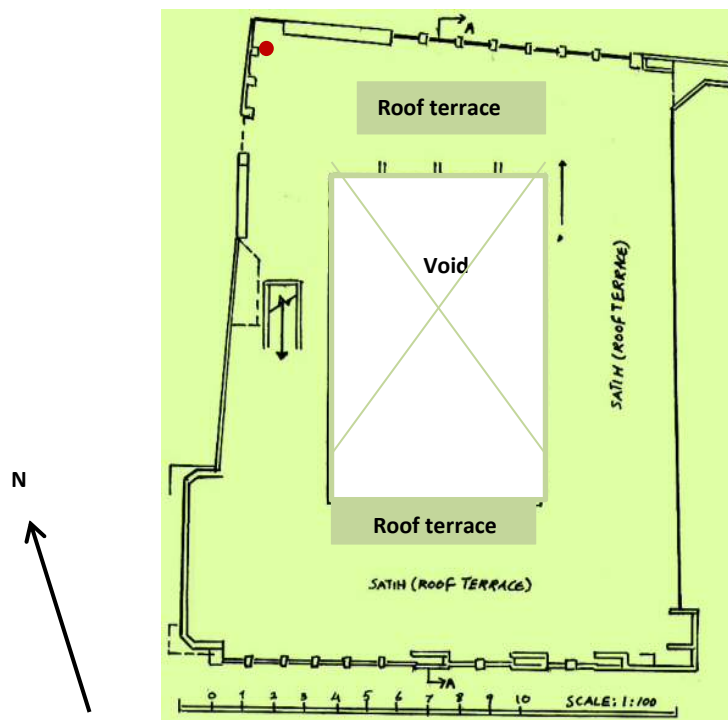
Roof terrace level plan (Researcher) Scale: 1:50
